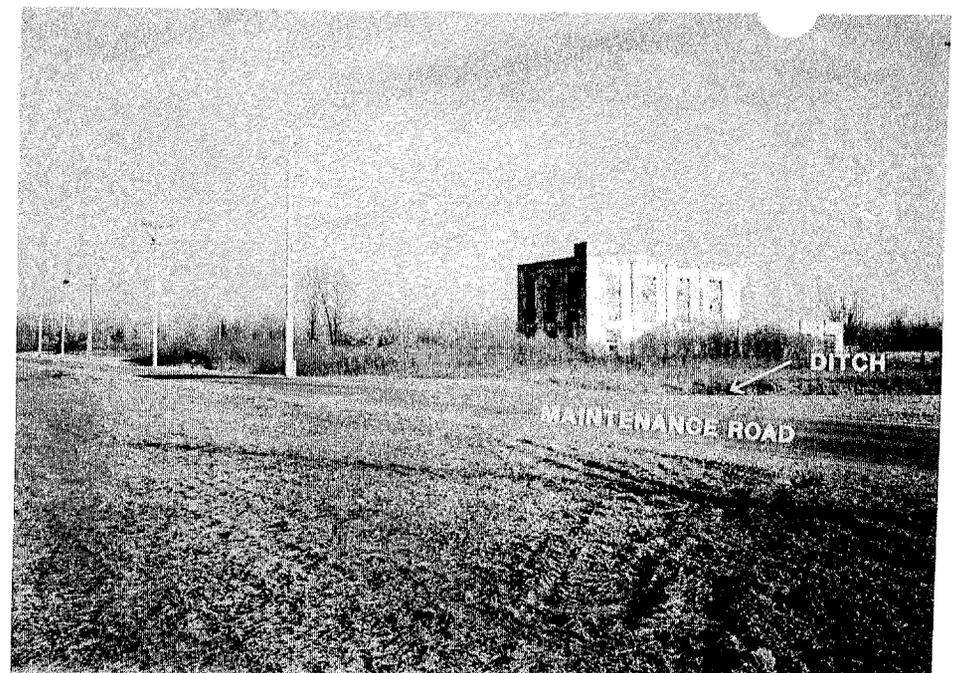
View looking southeast towards ash pit and Power Station #1 (photo taken in March 1995)
